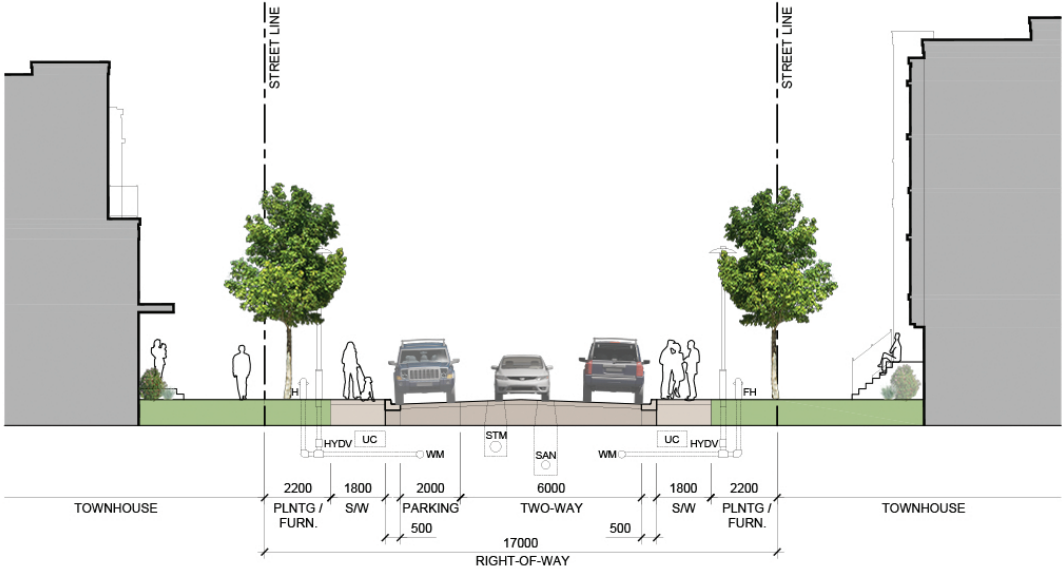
Example of a local street with sidewalks situated along the curb
